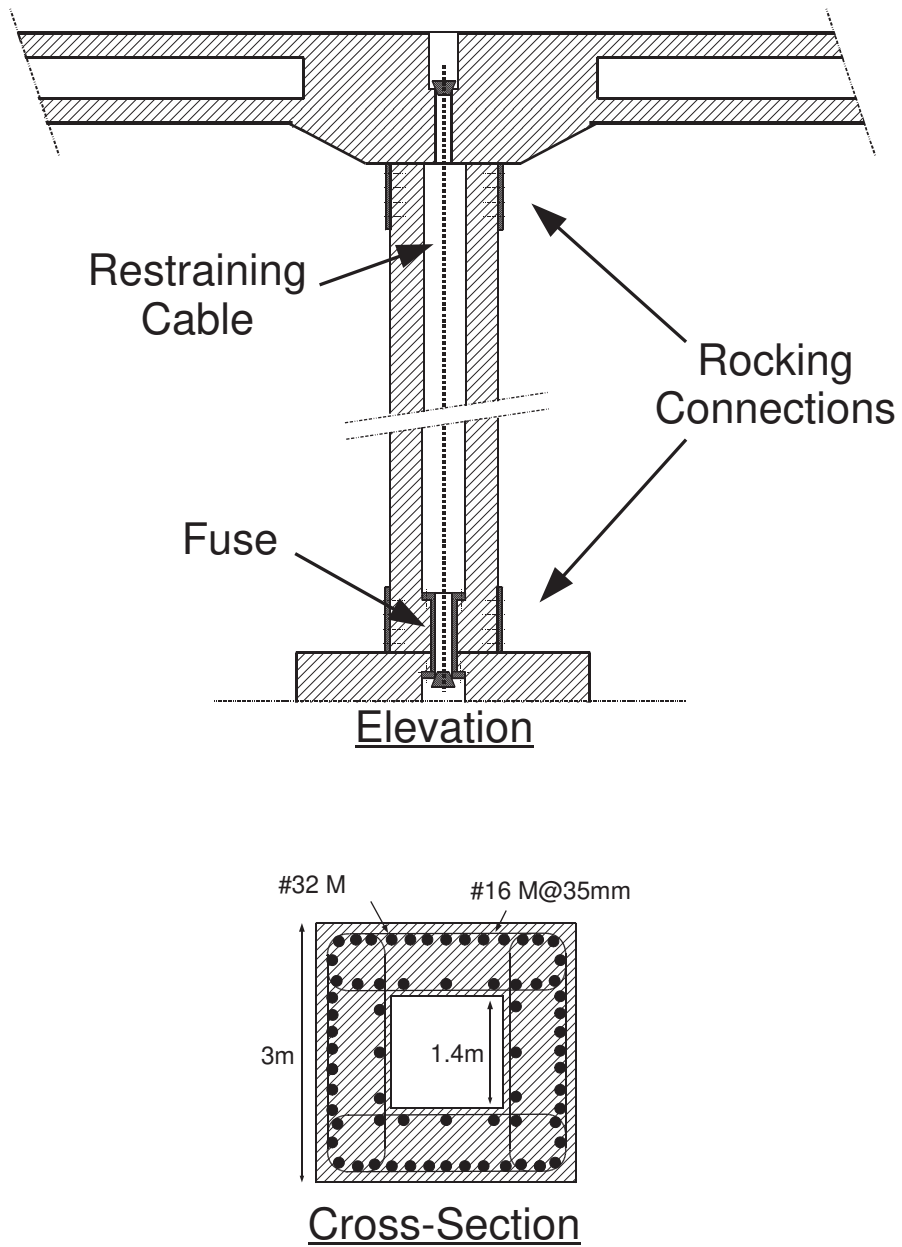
Drawing Outline of the Column Connections with its Footing and the Super-structure
